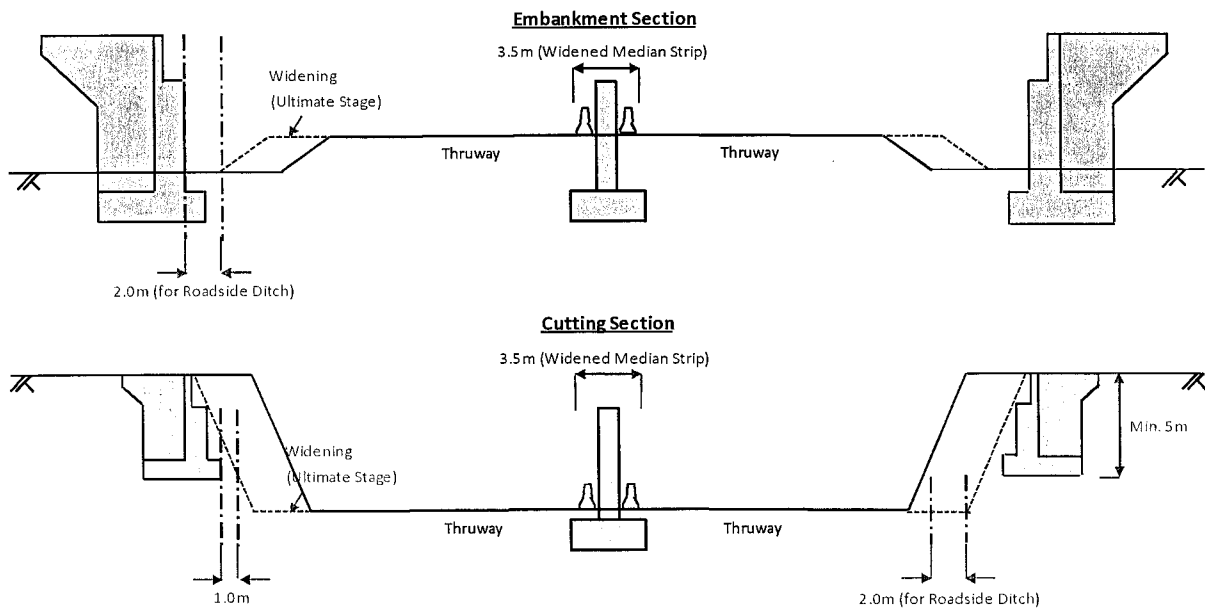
Minimum Requirements for Abutment Location (IC Rampway Flyovers)
